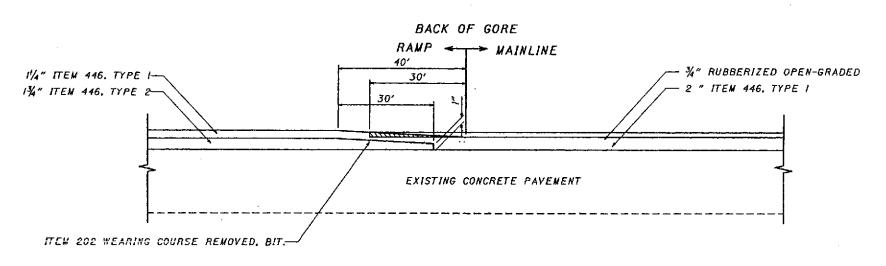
, TYPICAL RAMP TRANSITION TO MAINLINE 33/4" OVERLAY
